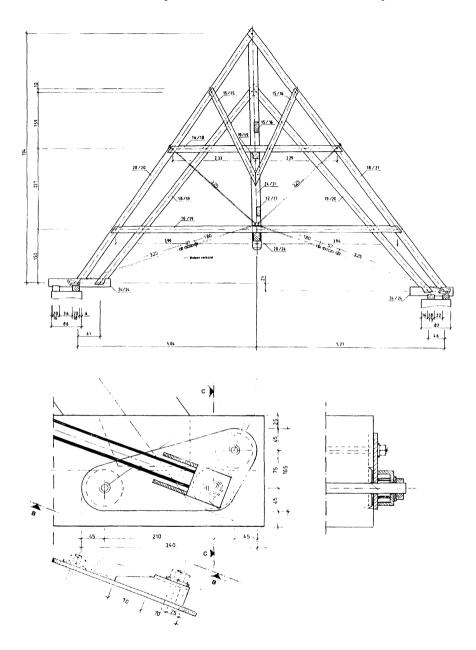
Realisation planning CFRP truss level A1, connecting detail of CFRP-loop
